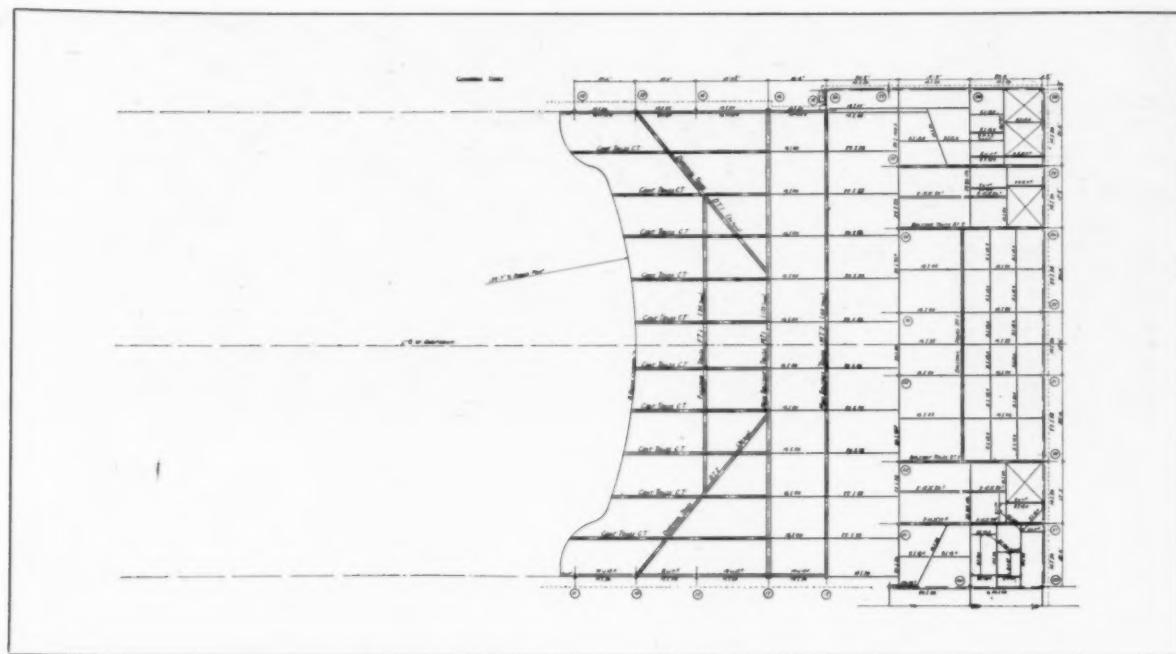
Main Balcony Framing Plan, Mastbaum Theater, Philadelphia
